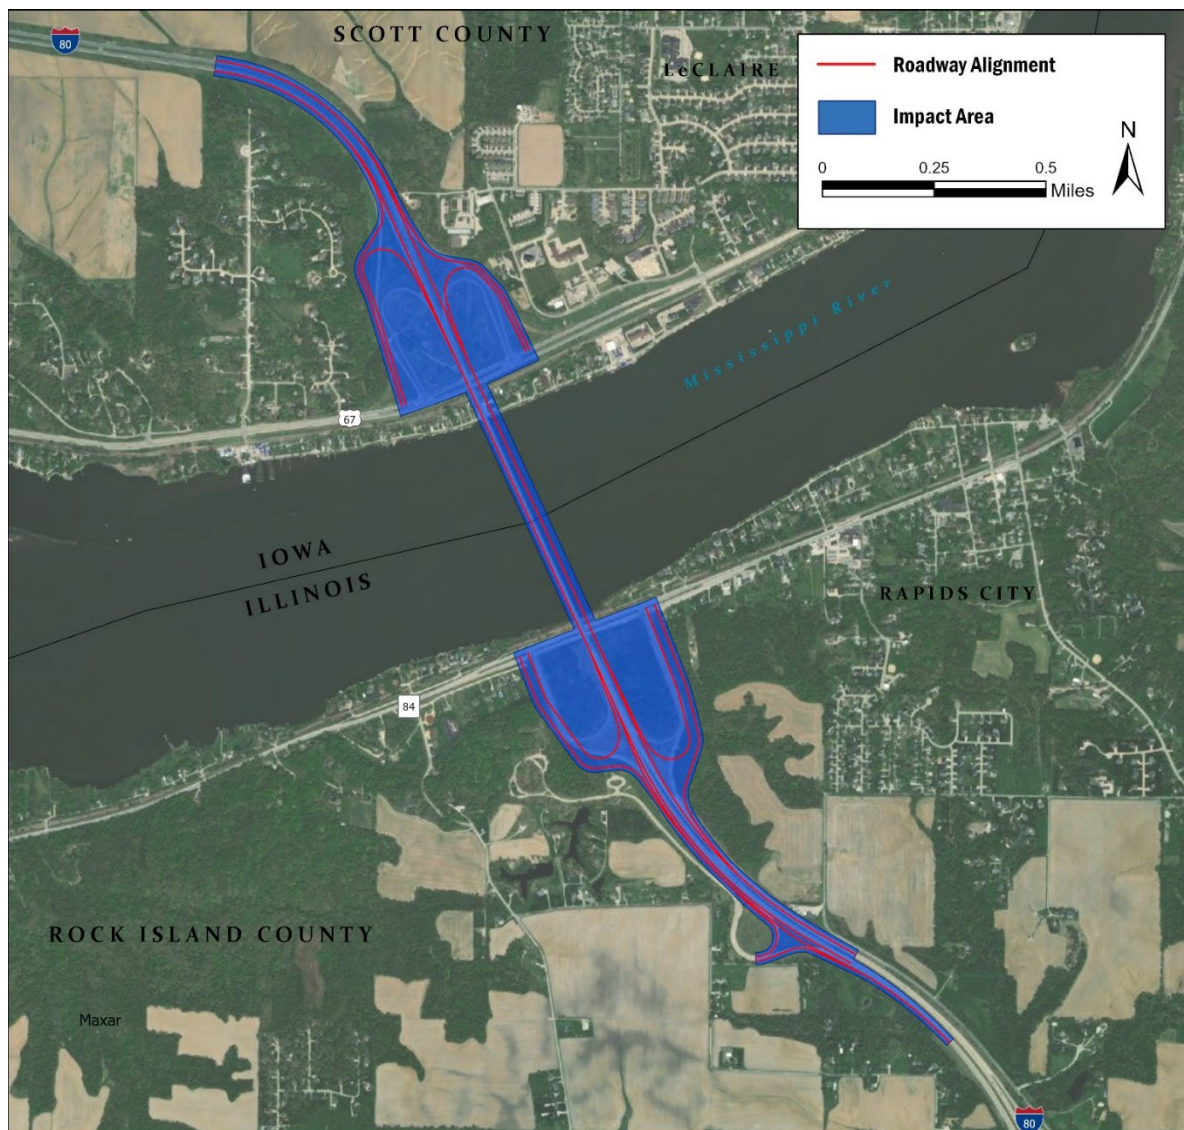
ALTERNATIVE 3 – BRIDGE REPLACEMENT WEST
